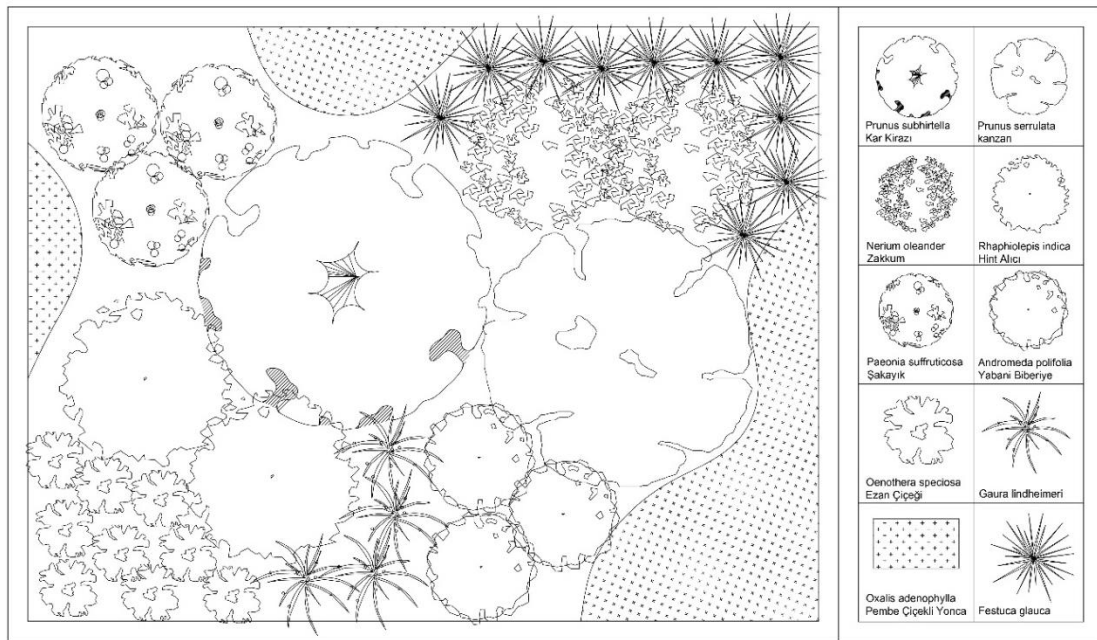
Planting design plan with pink color effect (Scale: 1/40)
